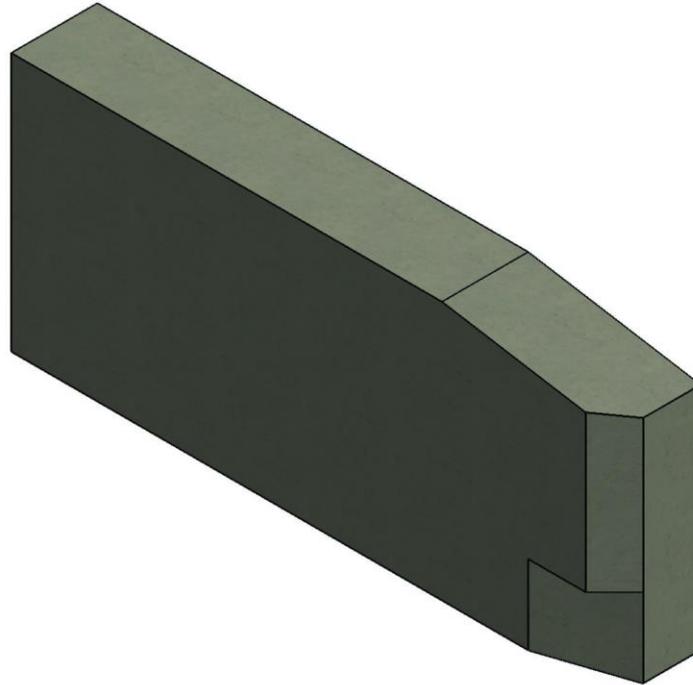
General Shape of Standardized Buttress Incorporating Dual Tapered Front Edge
